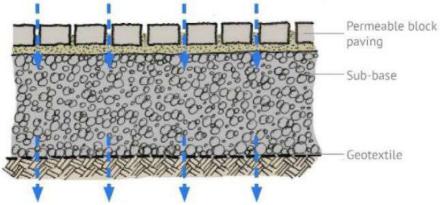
Typical section through permeable paving and sub-base showing infiltration
